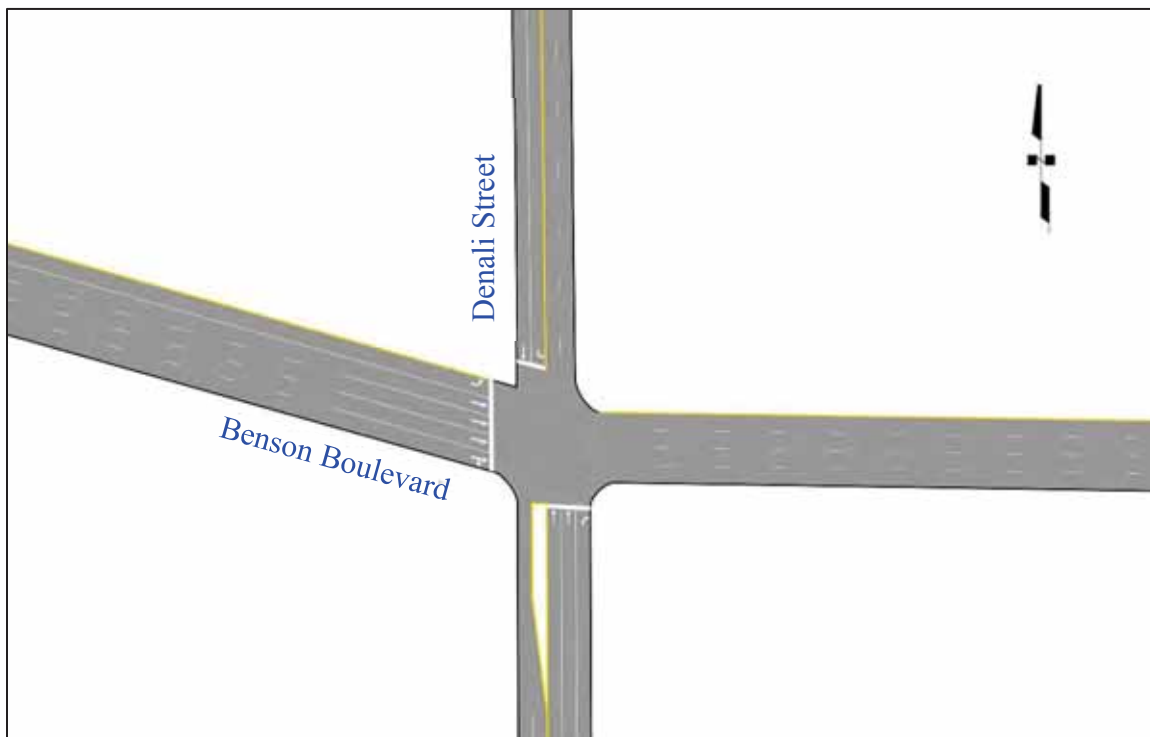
Lane Reduction between Northern Lights Boulevard and Benson Boulevard
